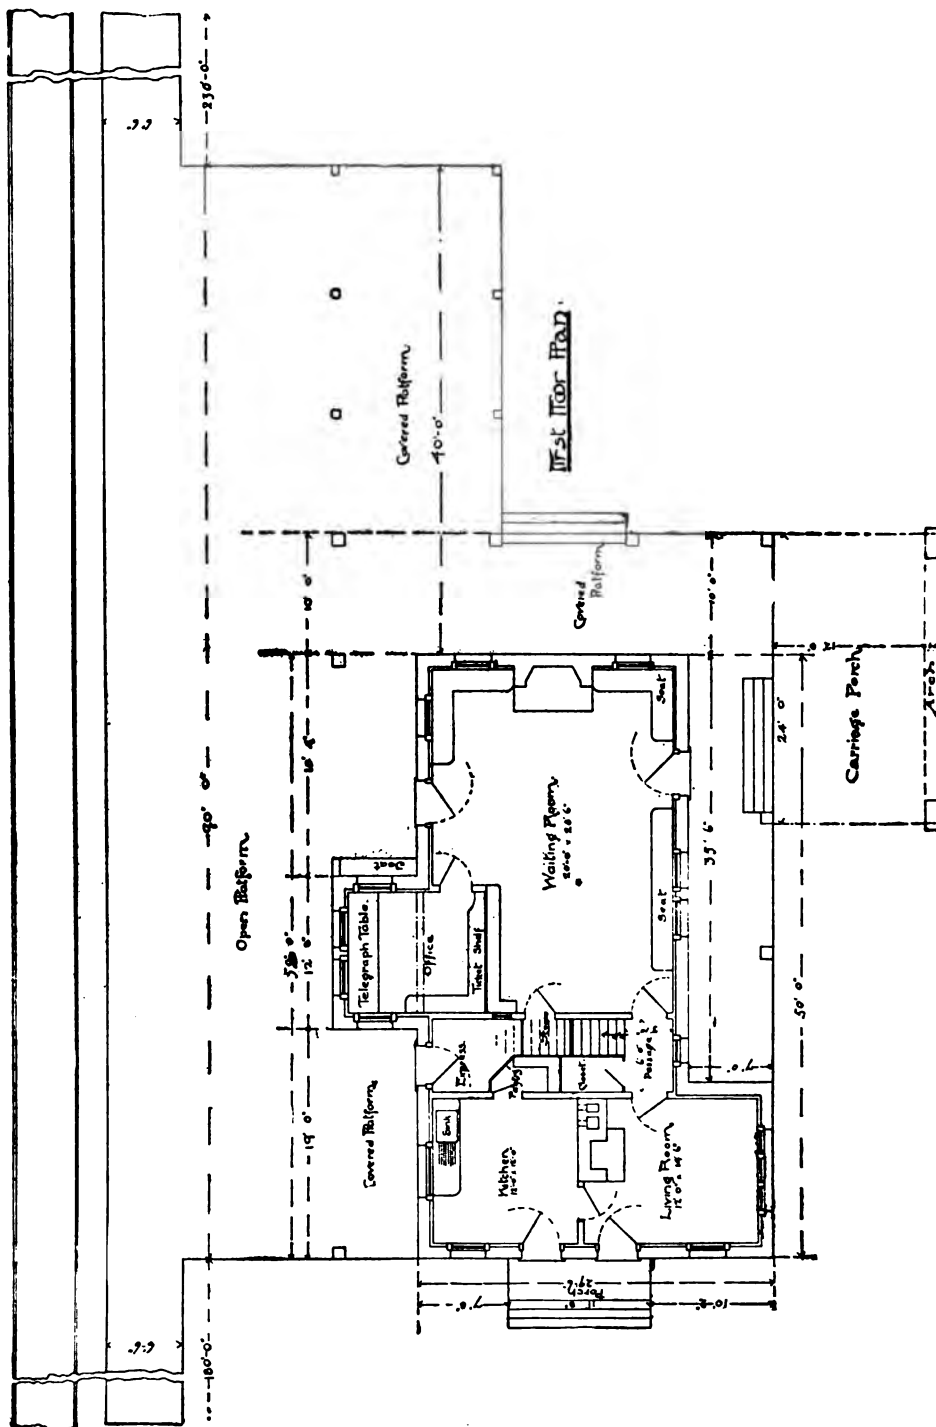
GROUND FLOOR PLAN OF LOCAL PASSENGER DEPOT AT OAKDALE, LONG ISLAND R. R. (PLAN NO 89—CONTINUED.)
